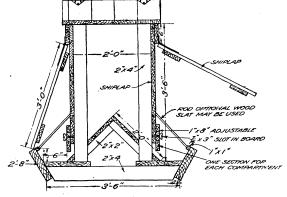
The Ohio self-feeder; end view with end siding boards removed.
